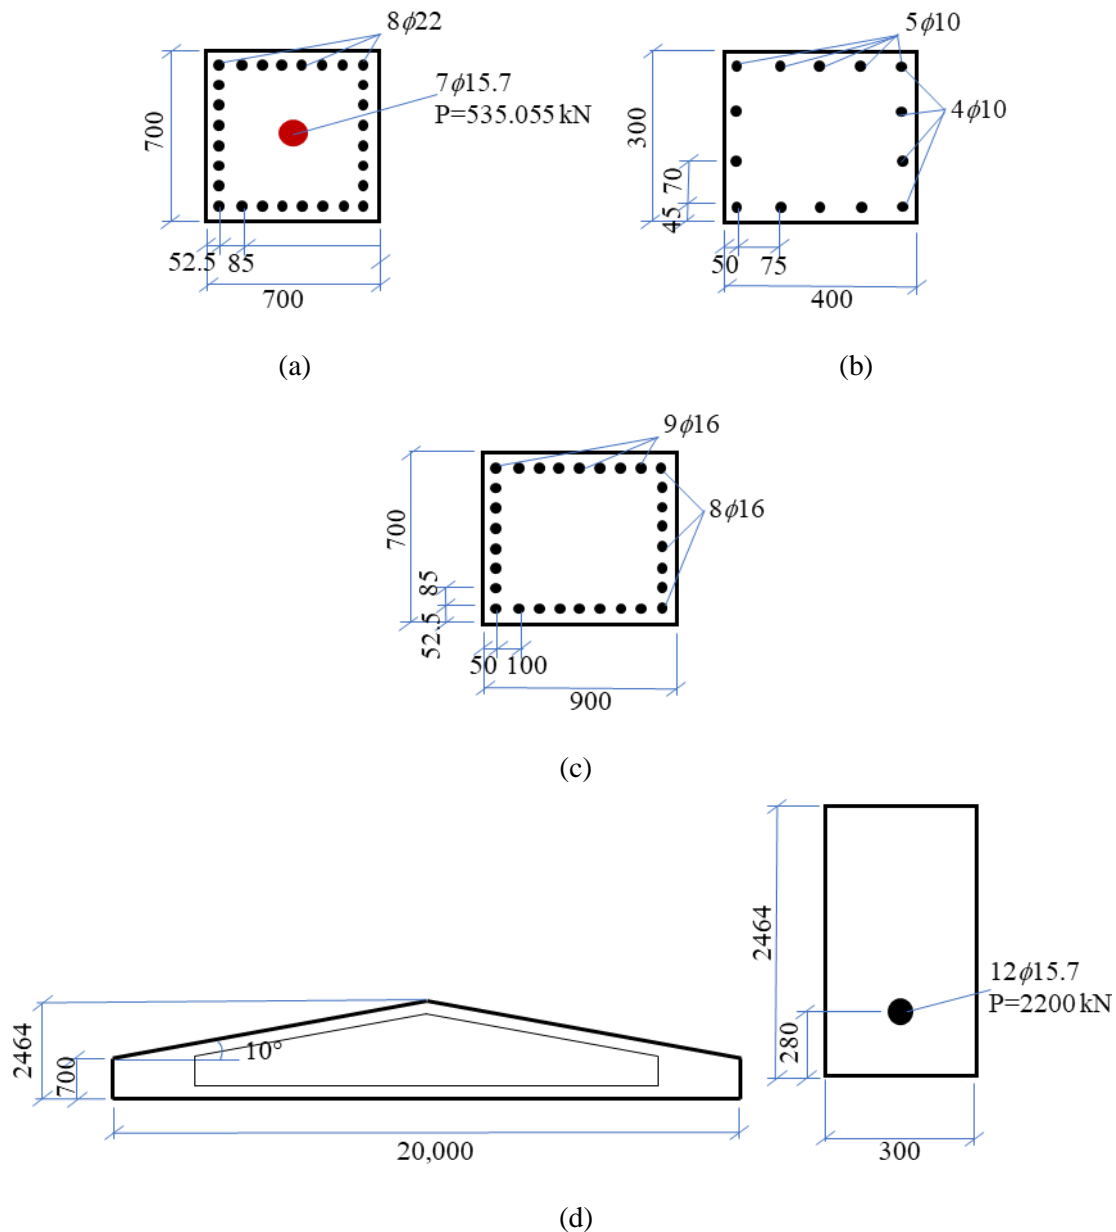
The section of: (a) the PT columns; (b) the secondary beams and support beams; (c) the support columns; and (d) the principle beams.
